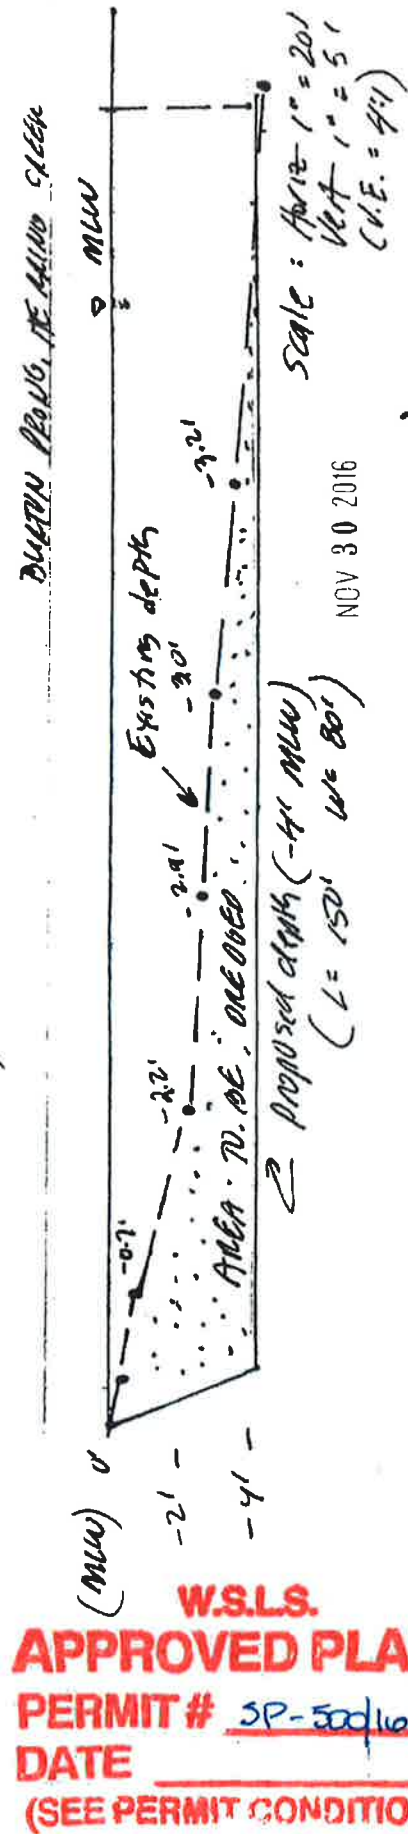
Cross-section sketch of proposed marina structure. Existing MLW and proposed depths also depicted.
